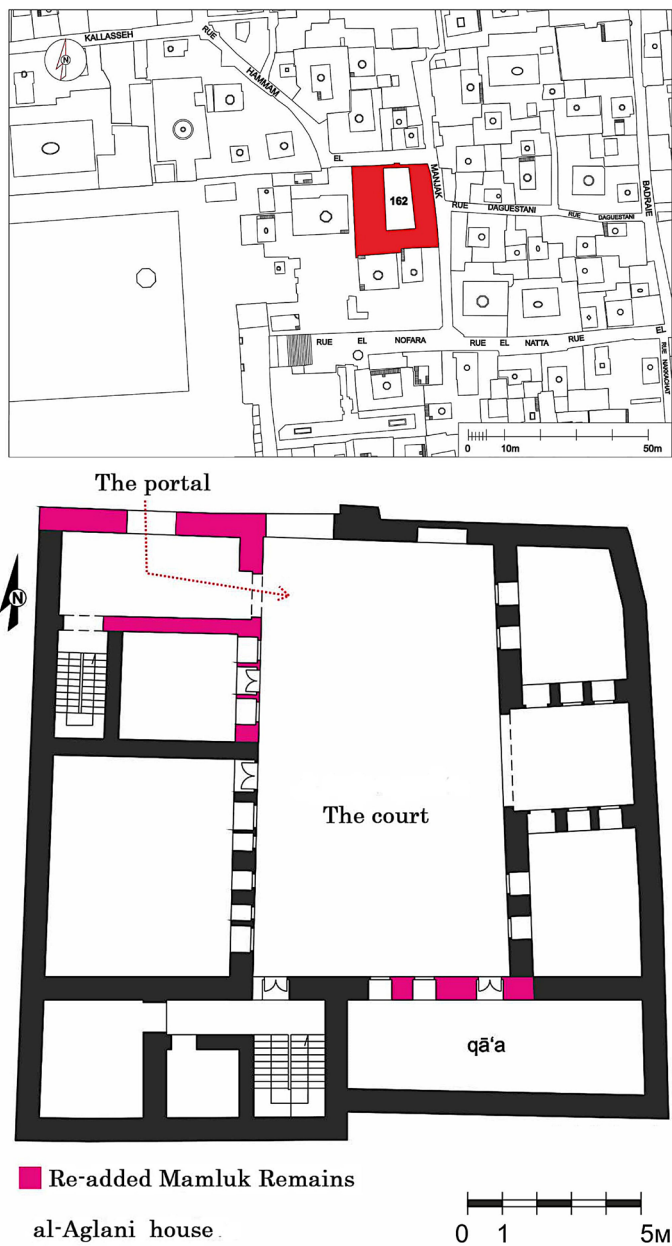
The al-Aglani House: cadastral plan showing the house and ground floor plan. Author’s illustration, CC BY-NC-ND.
